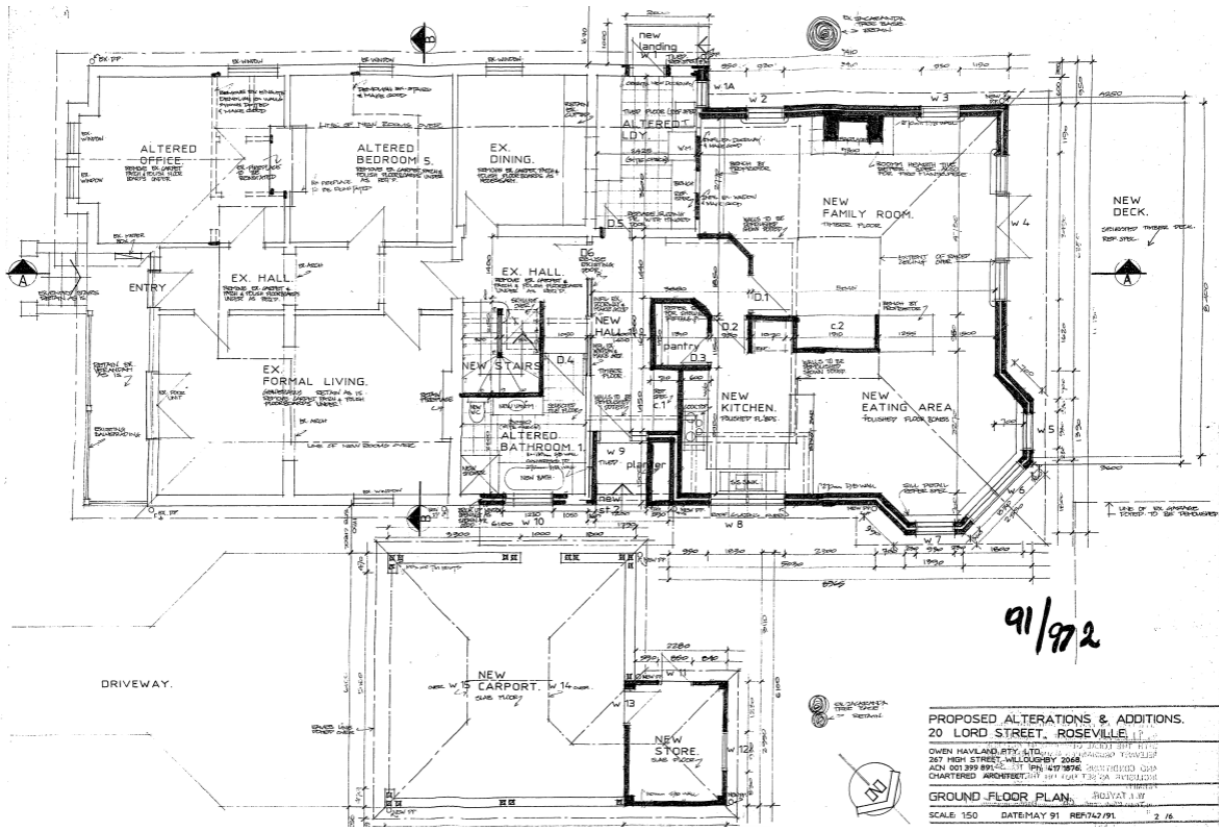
Ground floor plan of dwelling and additional carport alterations and additions dating from 1991
